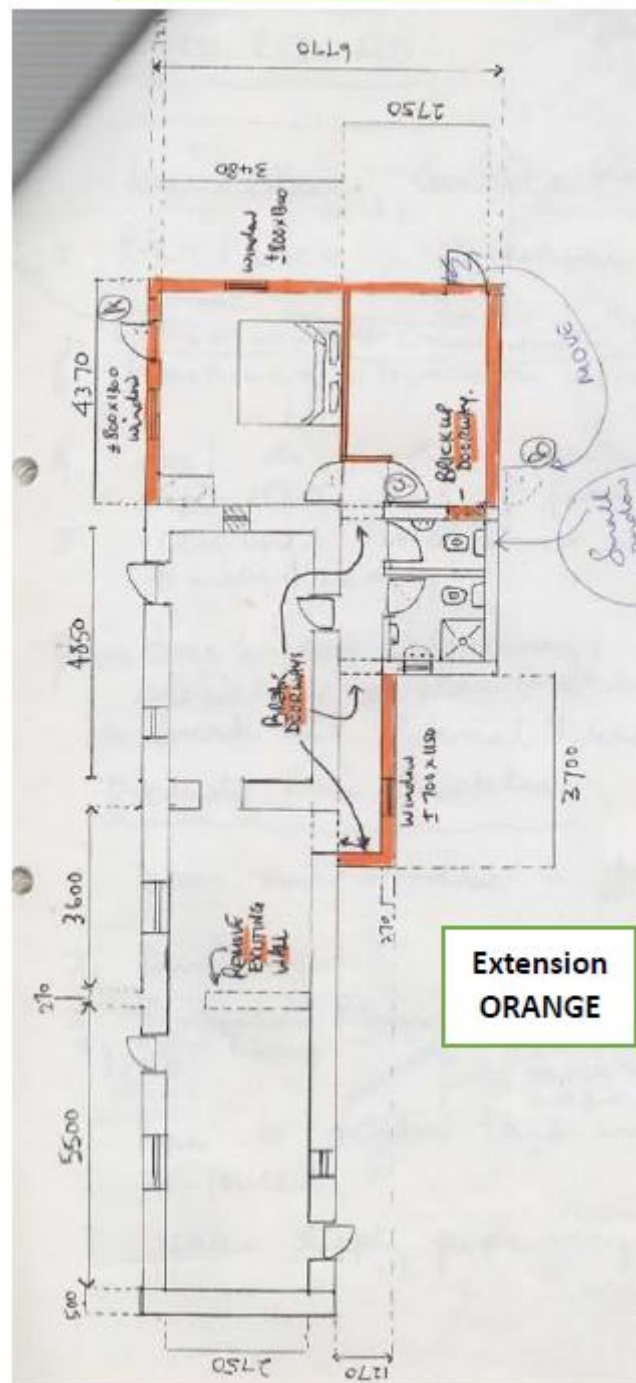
1997 Cottage Extension Floor Plan — Portion 16, Farm Rocklands No. 633
